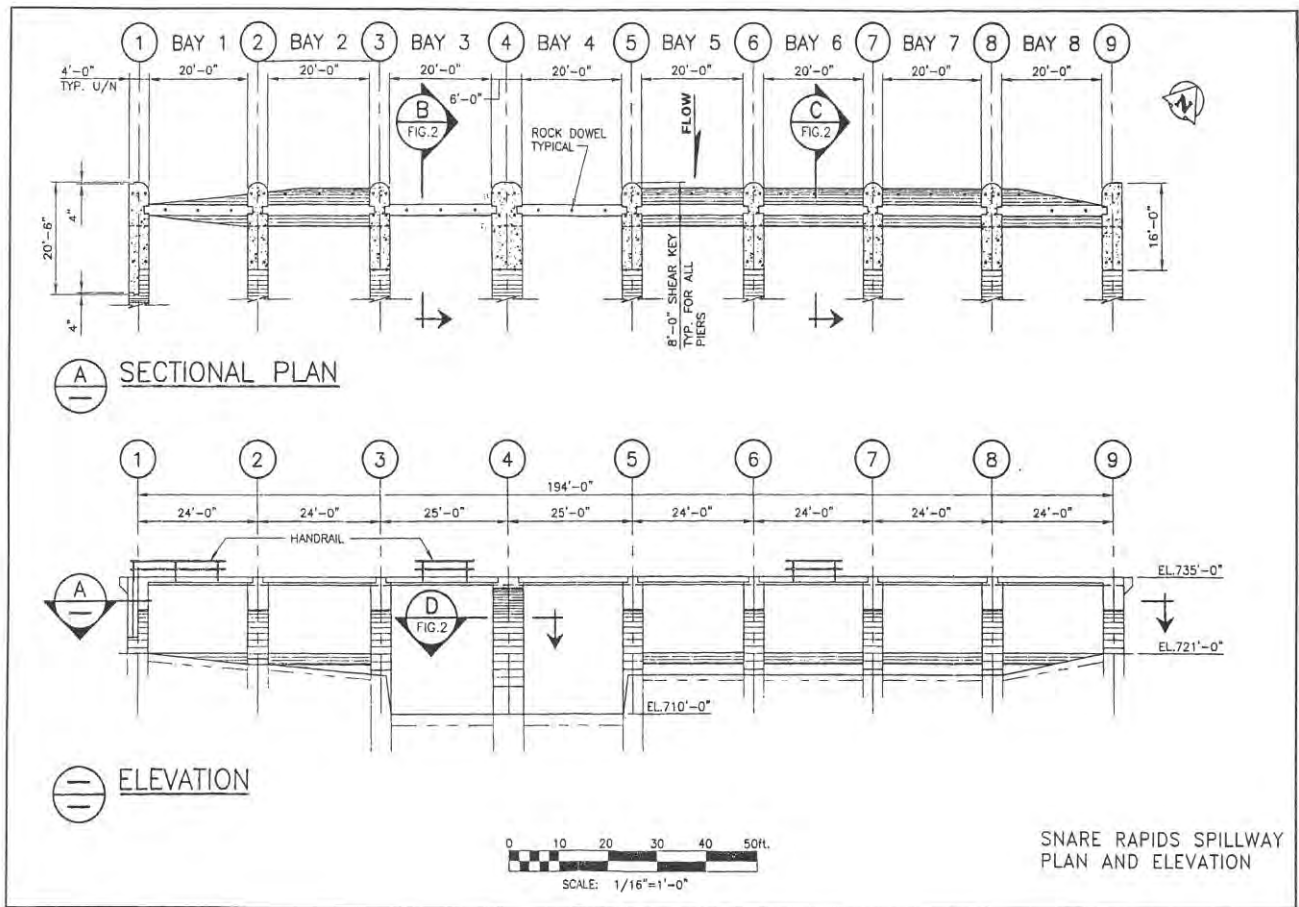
General Arrangements - Snare Rapids (5B) Spillway
